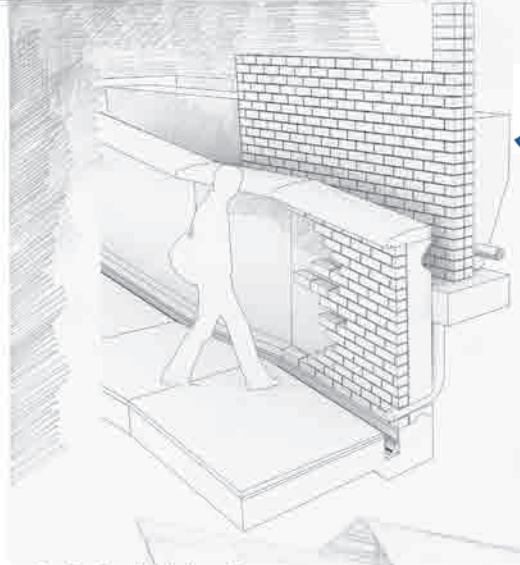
ROOF DETAIL SCALE: 1 : 5
